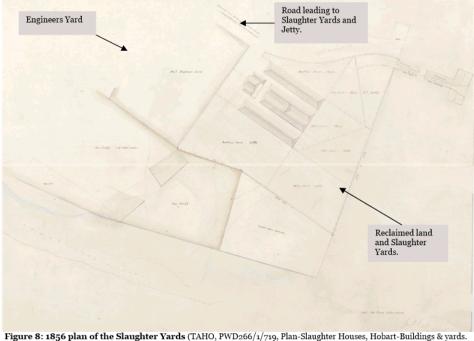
1856 plan of the Slaughter Yards (TAHO, PWD266/1/719, Plan-Slaughter Houses, Hobart-Buildings & yards. Architect, W.P. Kay, 1856. Reproduced with permission).
